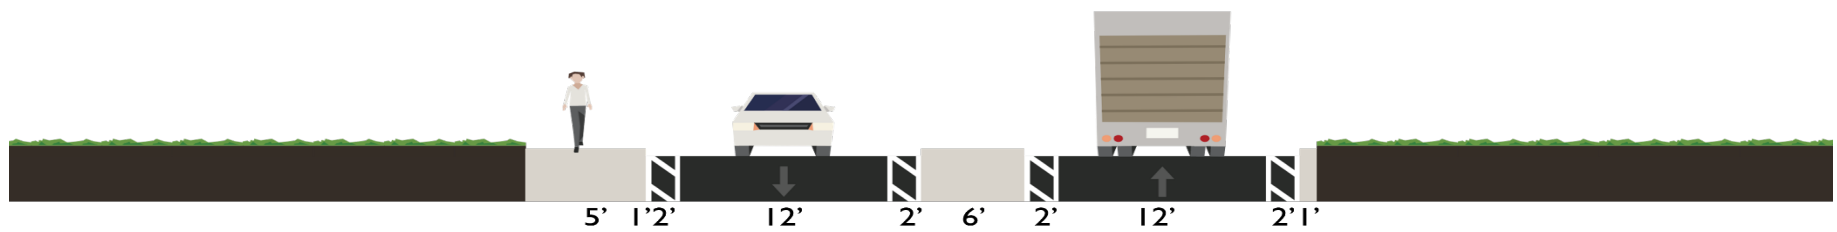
Sidewalk Along North Side of Road with Curb and Gutter
